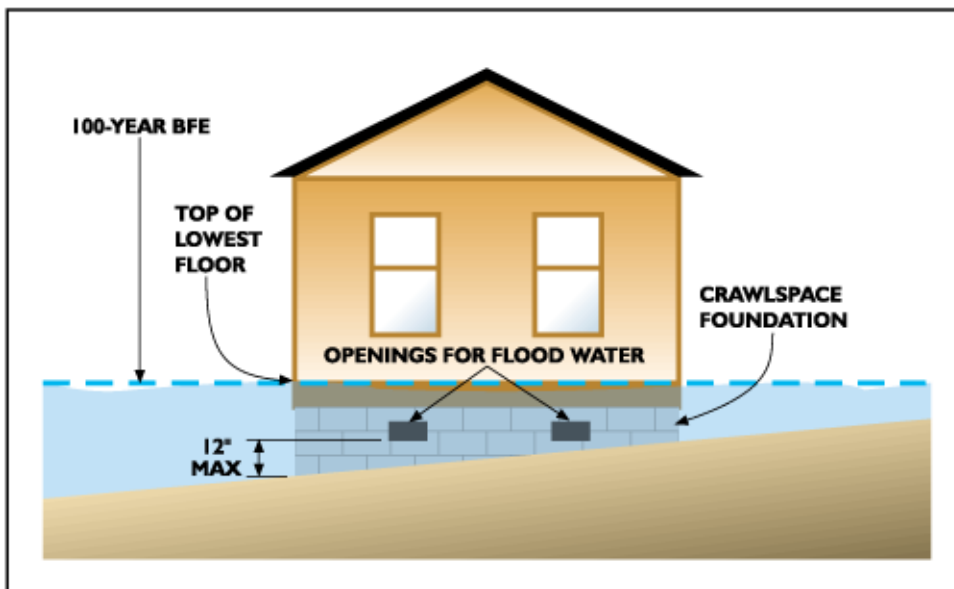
The top of the lowest floors of buildings in A-Zones must be at or above the BFE. Foundation walls below the BFE must be equipped with openings that allow the entry of flood waters so that interior and exterior hydrostatic pressures can equalize.
